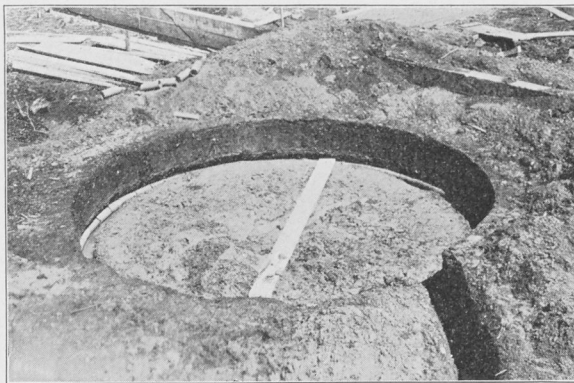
Excavation for Silo Showing Tile in Place for Draining Foundation.
